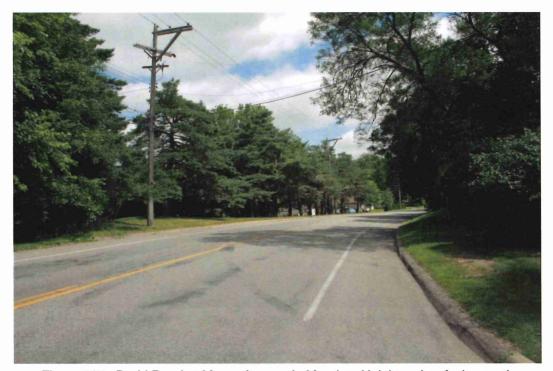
Dodd Road at Mears Avenue in Mendota Heights, view facing north.
